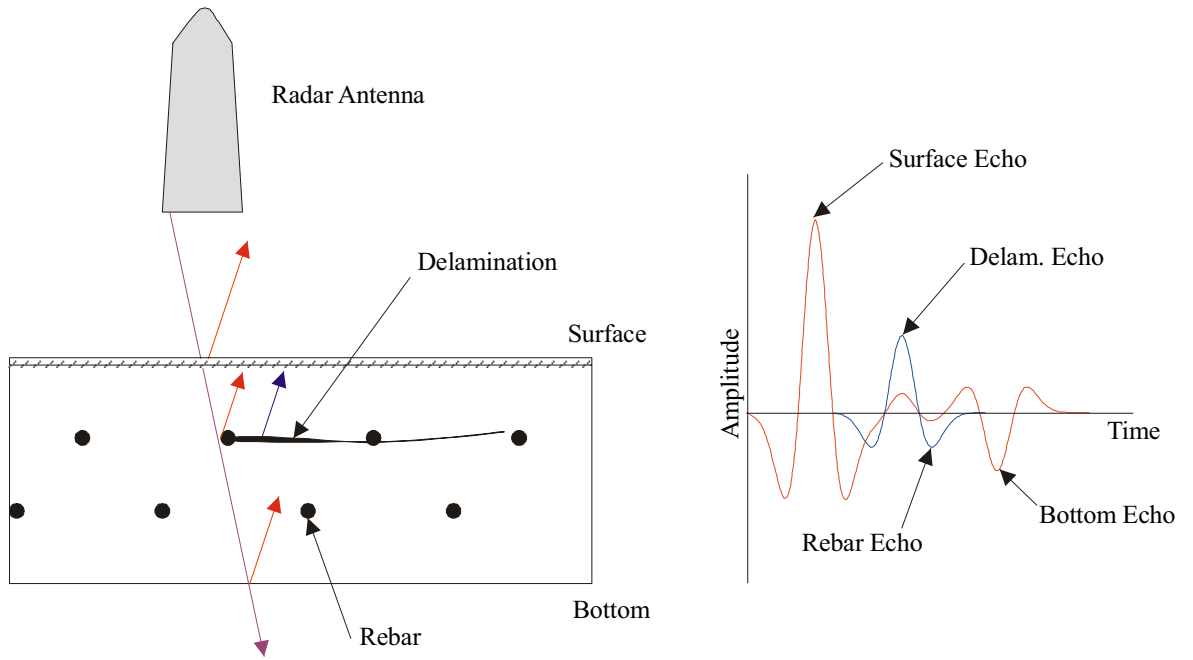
Ground Penetrating Radar. Location of reinforcement bar or delaminations.
